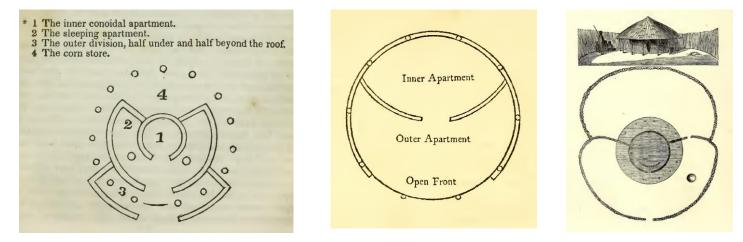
Examples of house structures the travellers encountered: i) a plan of a Boochuana building as indicated by Kay (1834); ii) Barrow's plan of a Boochuana structure (Barrow 1806); iii) Burchell's plan of a Thlaping structure (Burchell 1824).
